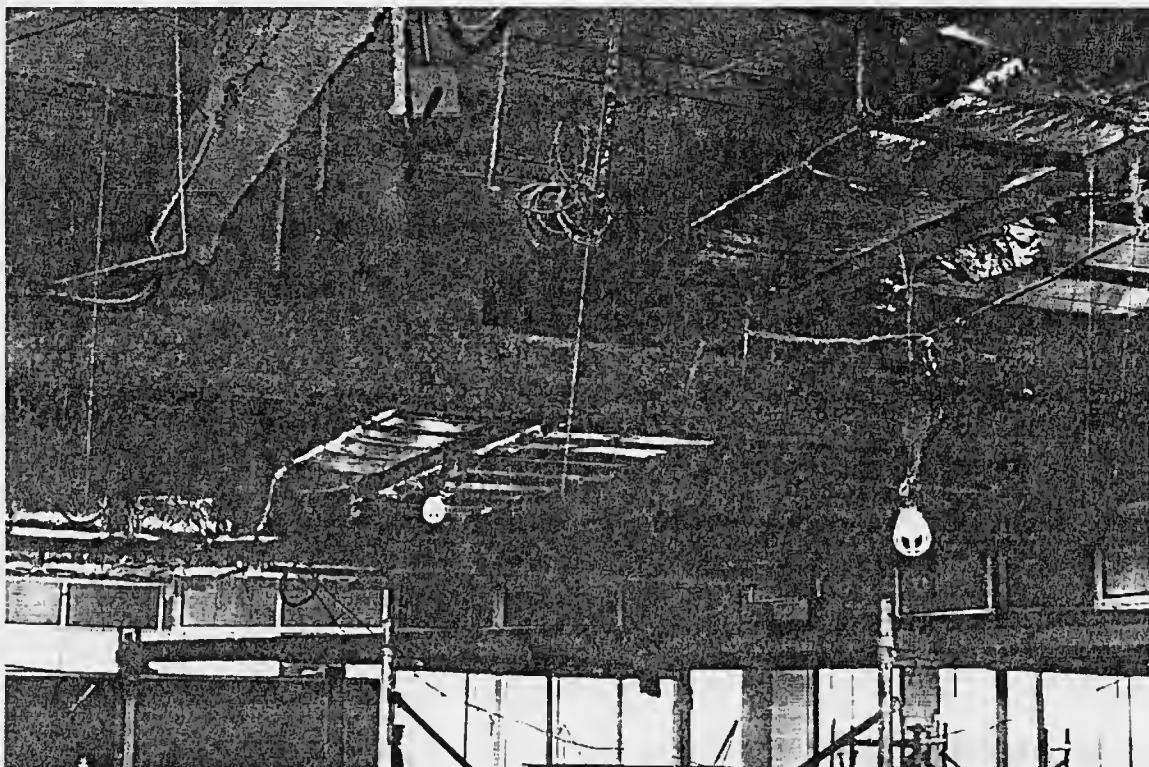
Photograph of mechanical ductwork running through a typical stub-girder
